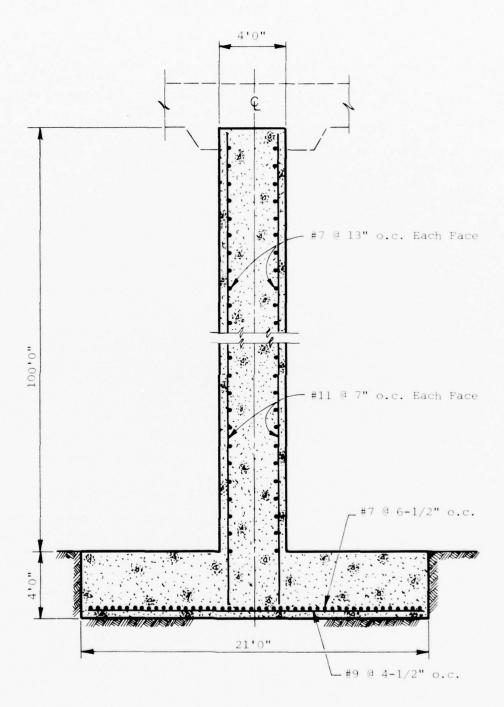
Intermediate Walls for Full-Scale DABS Facility
